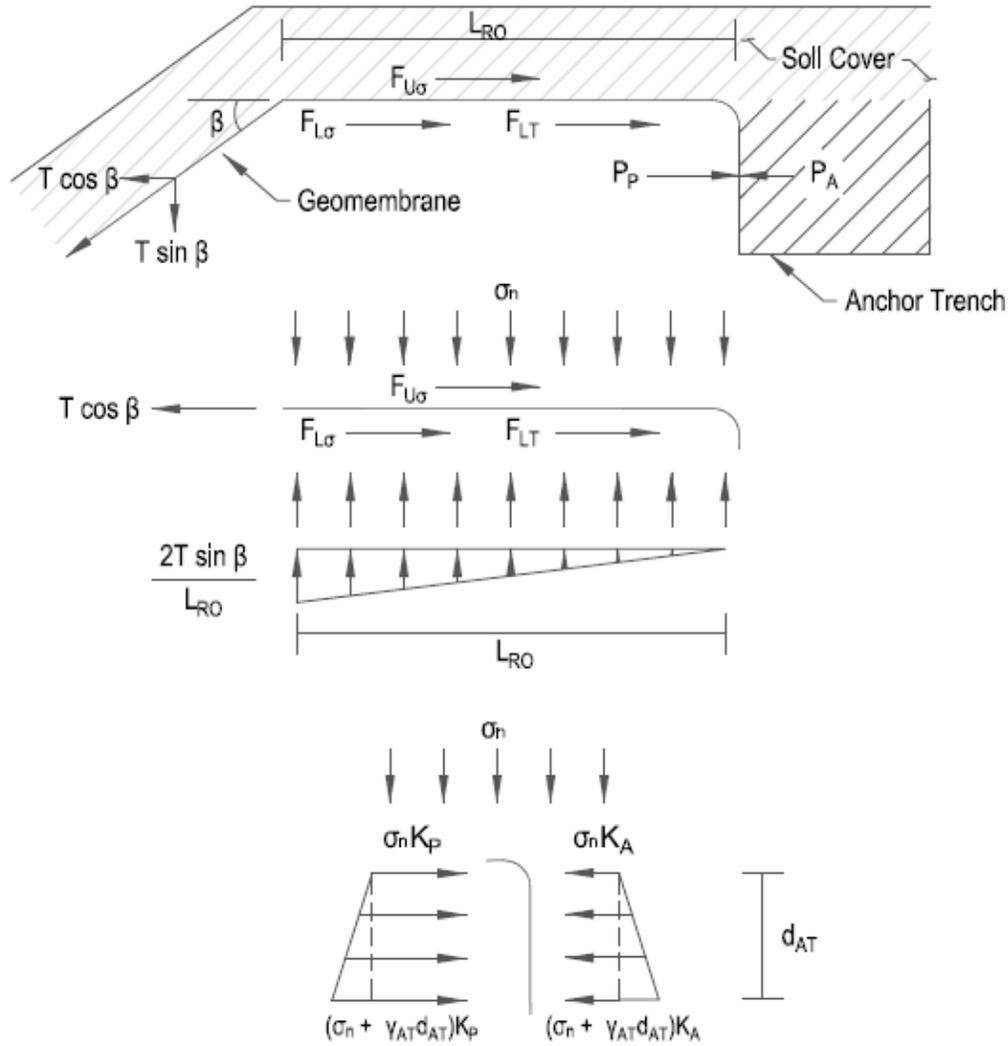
Geomembrane anchor trench design: cross section and free-body diagrams (adapted from [4]).
